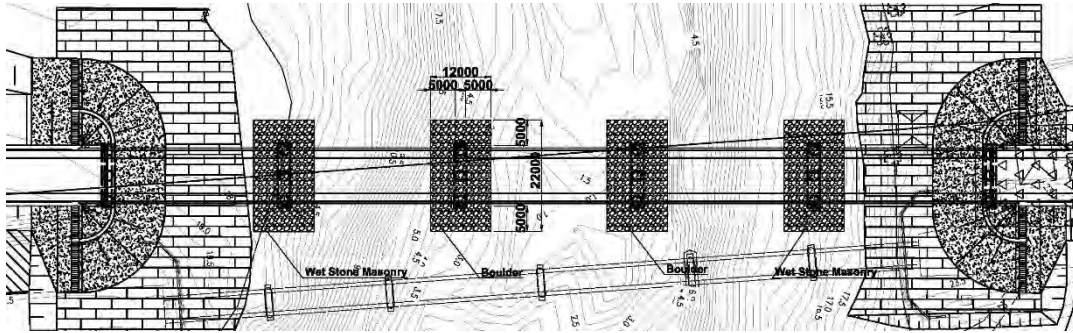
River Bed Protection of Prek Chhloung Bridge and Peam Te Bridge
